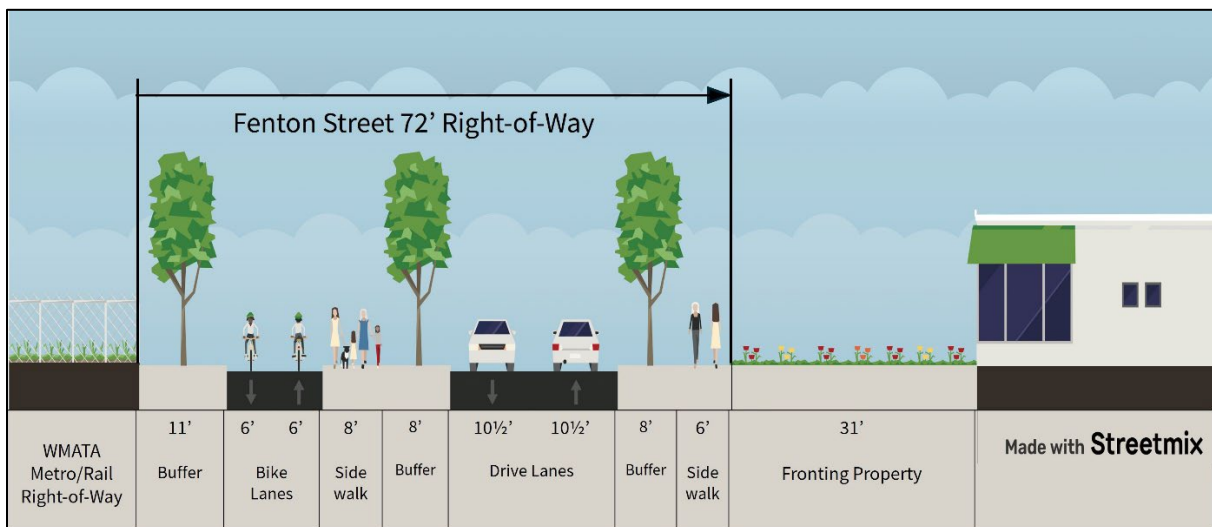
Existing Cross Section - Fenton Street (Station 72+00) - Looking North
